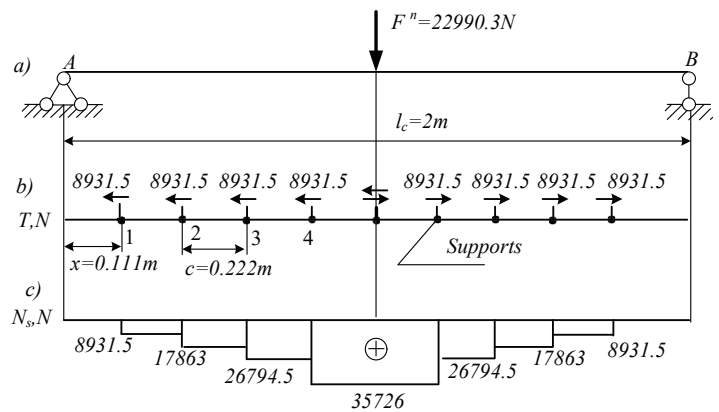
Arrangement of supports and a diagram of longitudinal forces in a steel plate: a – design diagram; b – diagram of the arrangement of stiff supports; c – diagram of longitudinal forces
